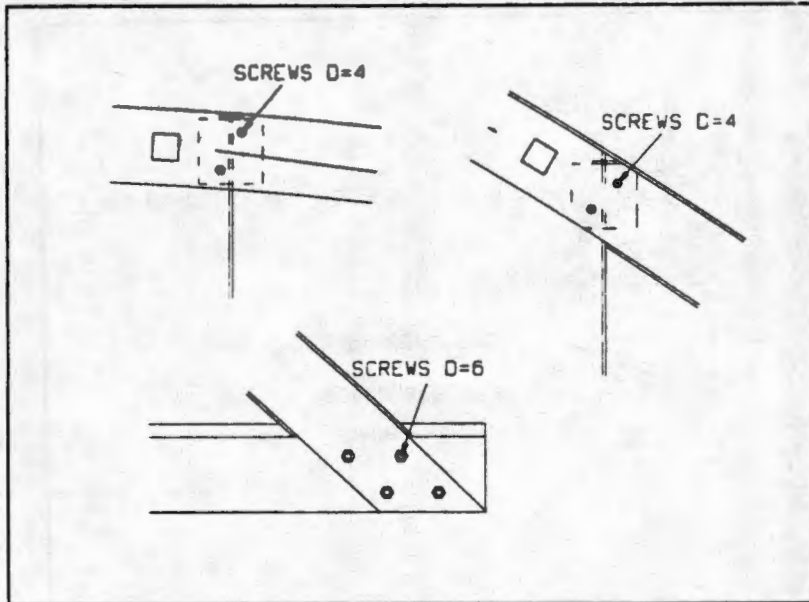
Joint details of the arch model. Dimensions in millimetres.
